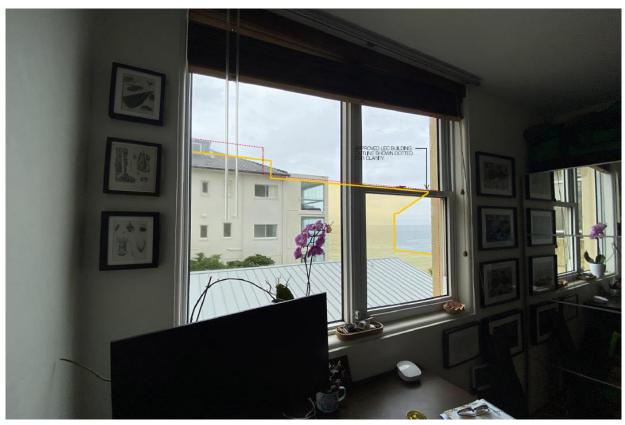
View from the Bedroom 2 showing the outline of the proposed built form
